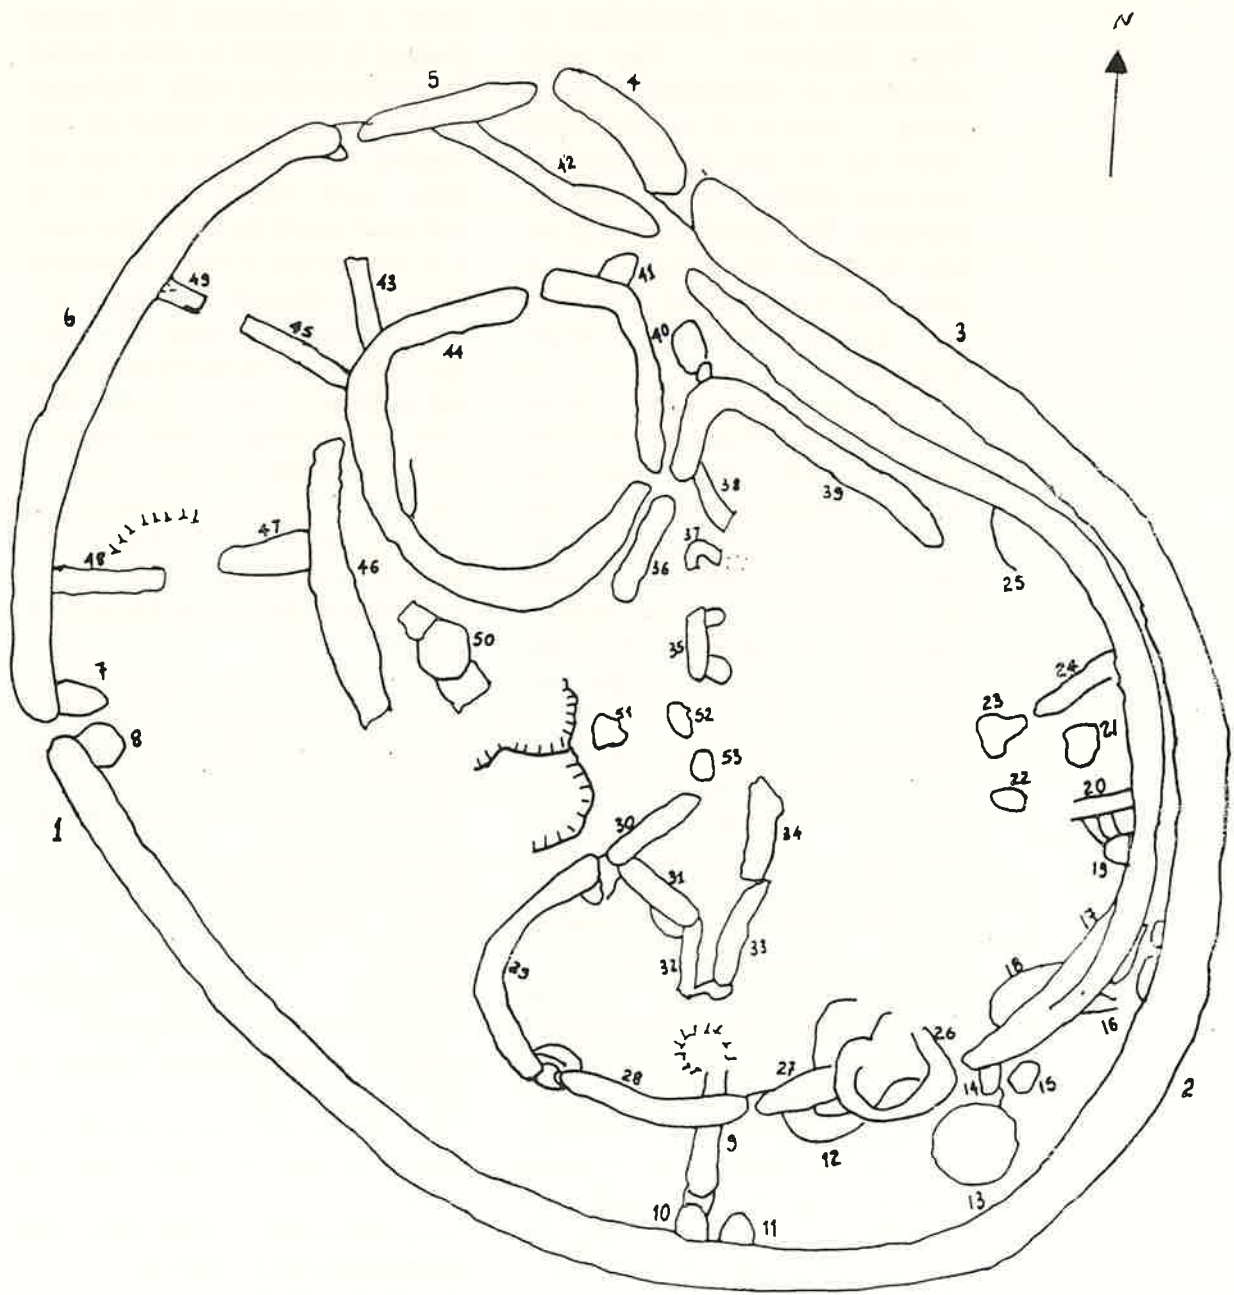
Plan of the Great Enclosure, Great Zimbabwe with wall numbers.
